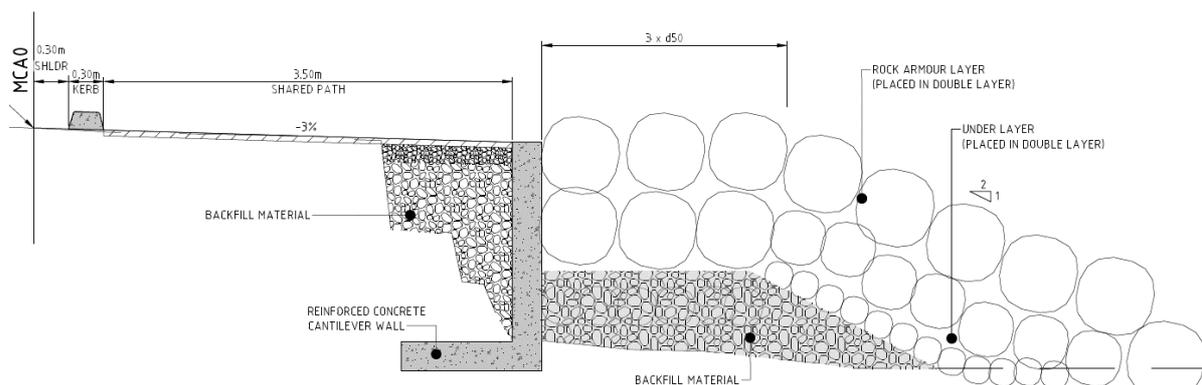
Revetment with reinforced concrete cantilever wall. Note a geotextile underlay (not shown) will be included between backfill and underlayer.
